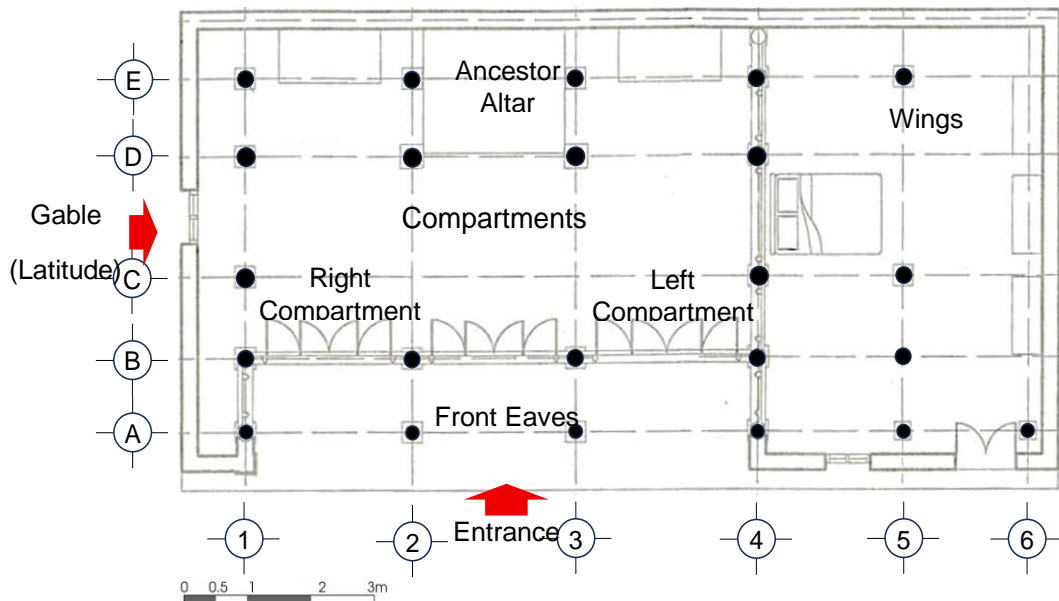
Floor plan of the “Nha Ke-Bay” (Type A).
